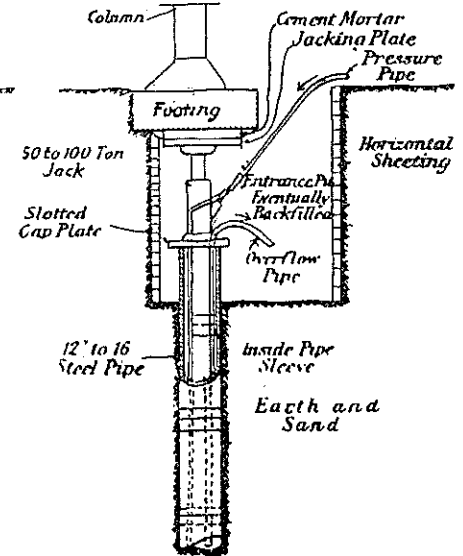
UNDERPINNING SMALL COLUMN PIERS.
